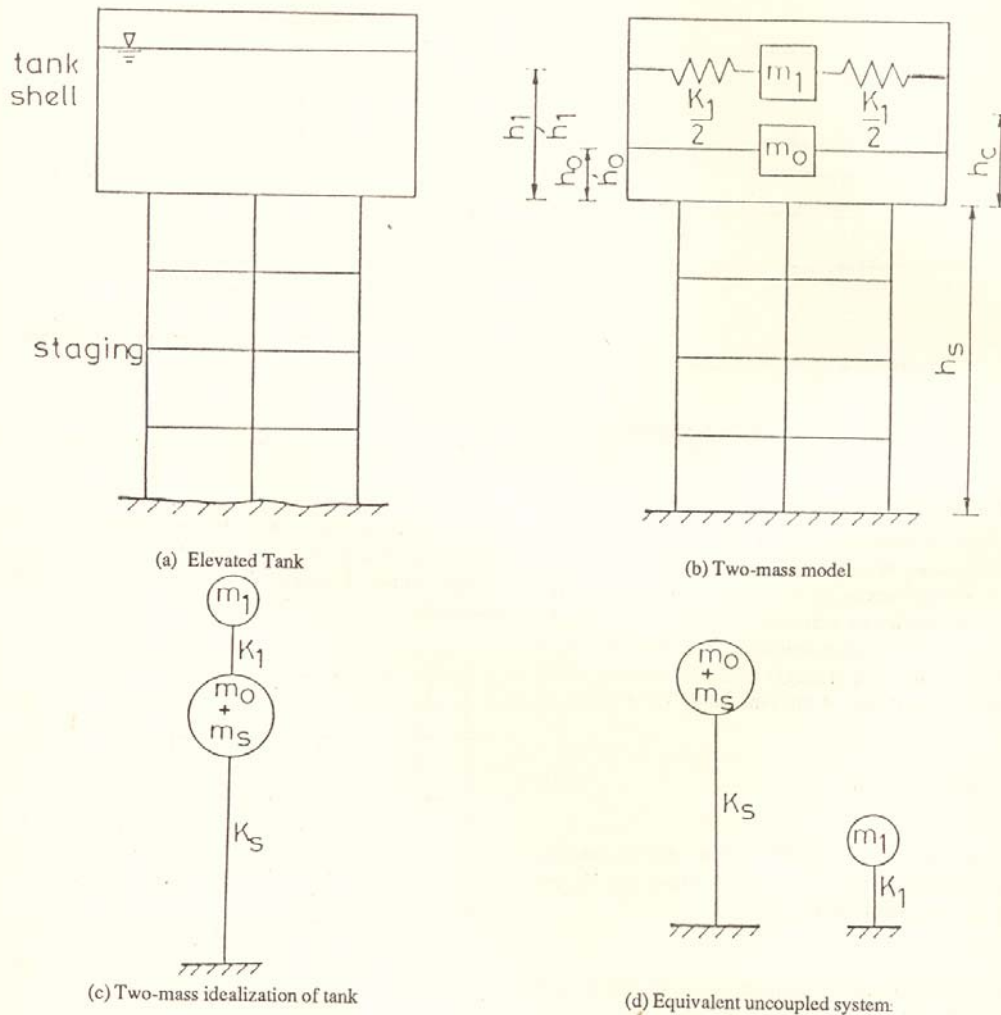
TWO-MASS IDEALIZATION OF ELEVATED TANK
